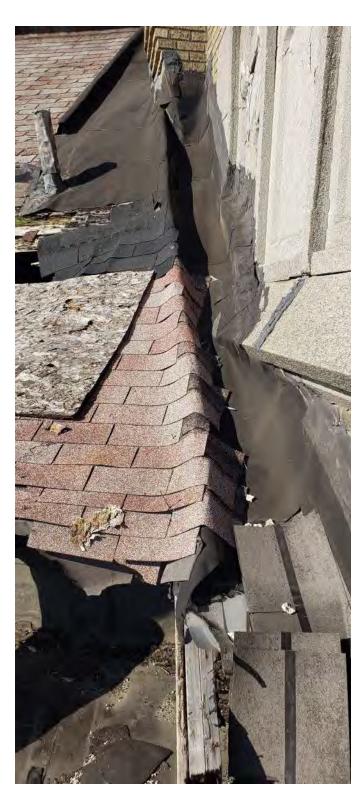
SIGNIFICANT DETERIORATION AT THE PERIMETER (TERMINATION OF DECORATIVE EAVES); EXTENSIVE WOOD ROT OF THE DECORATIVE EAVE OUTRIGGERS/RAFTER TAILS; PONDING WATER BELOW
